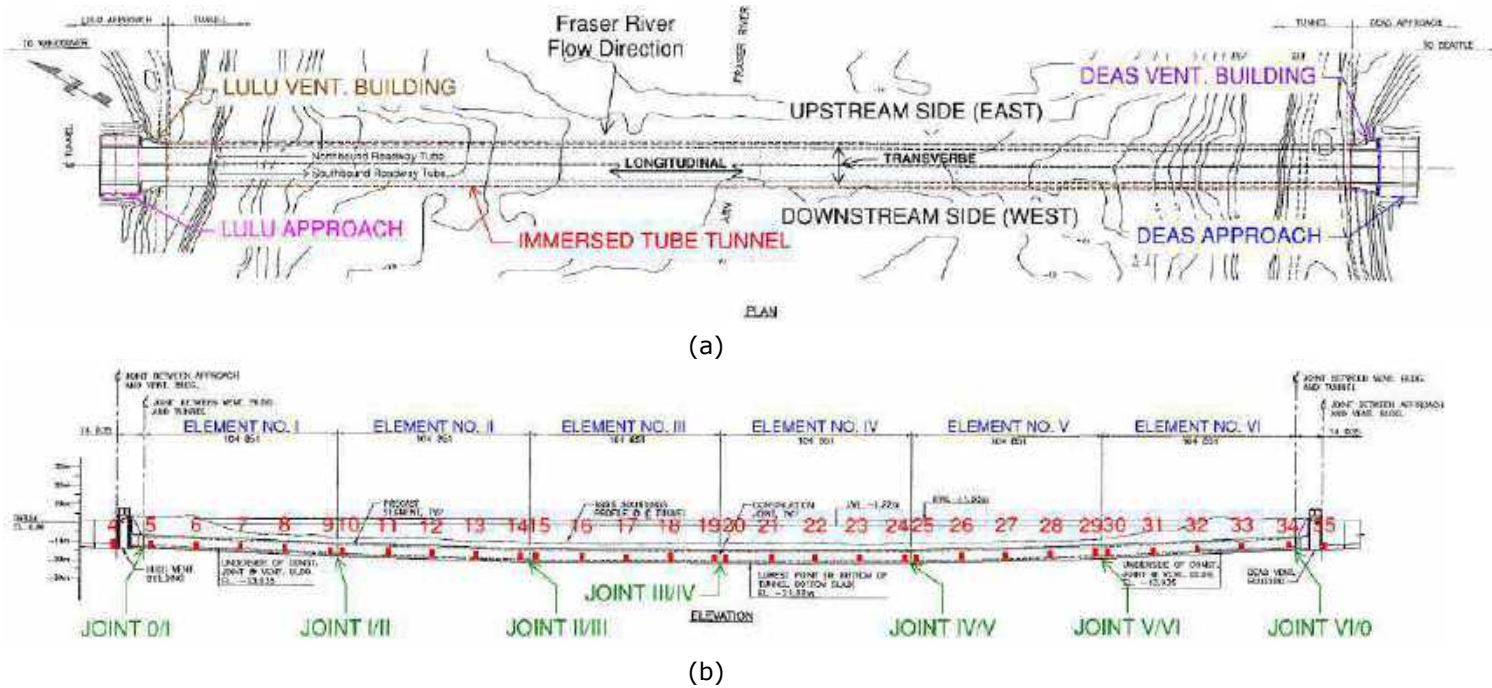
Orientation maps of the existing GMT: (a) A plan view of the tunnel, indicating the upstream and downstream sides and extents of the various components of the structure and (b) An elevation view of the structure, with tunnel element numbering system given in blue, joint numbering system given in green and emergency door numbering system given in red. Emergency door locations are indicative.
